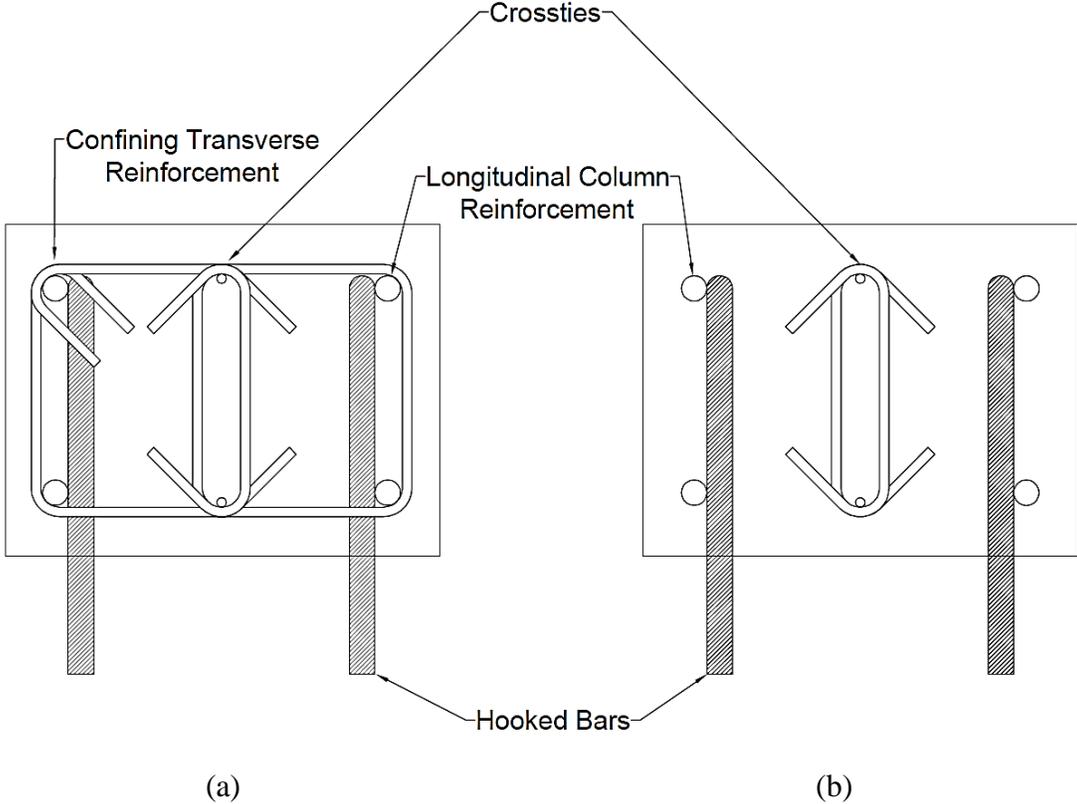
Cross section detail of specimens containing cross-ties (a) transverse reinforcement and (b) without transverse reinforcement. Shown with No. 3 longitudinal bars supporting the cross-ties
